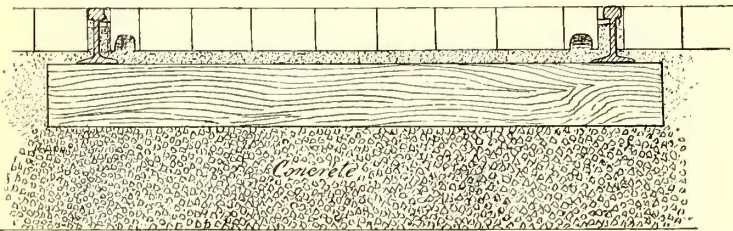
T RAIL TRACK CONSTRUCTION—TERRE HAUTE
